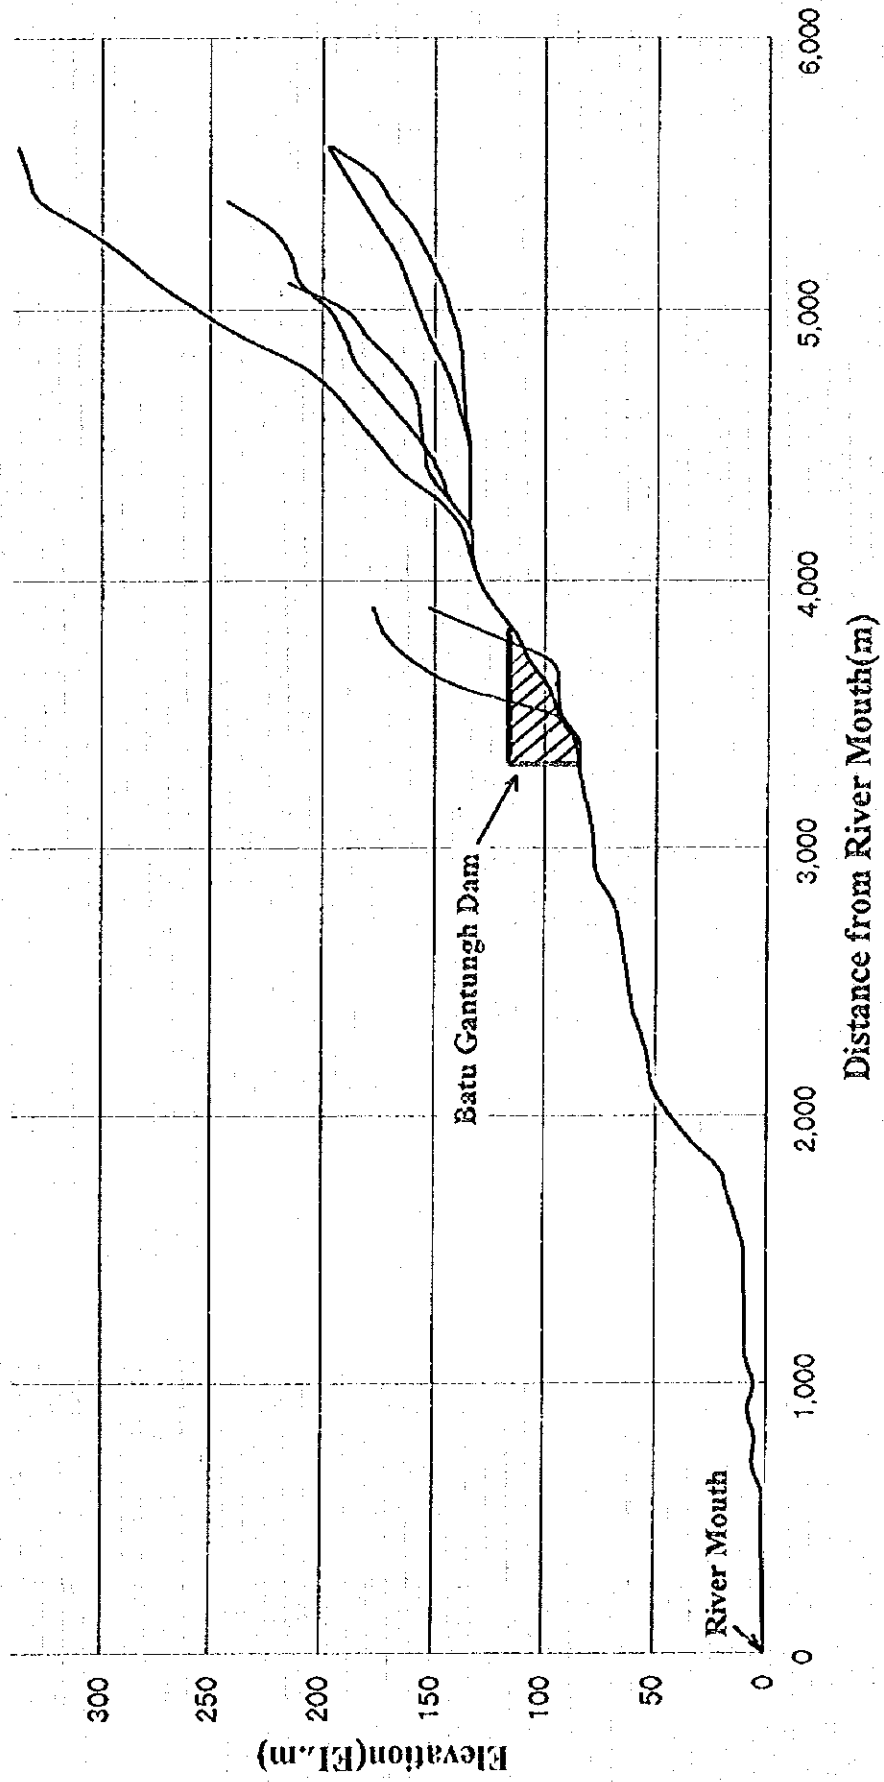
Longitudinal Section of the Batu Gantung River
